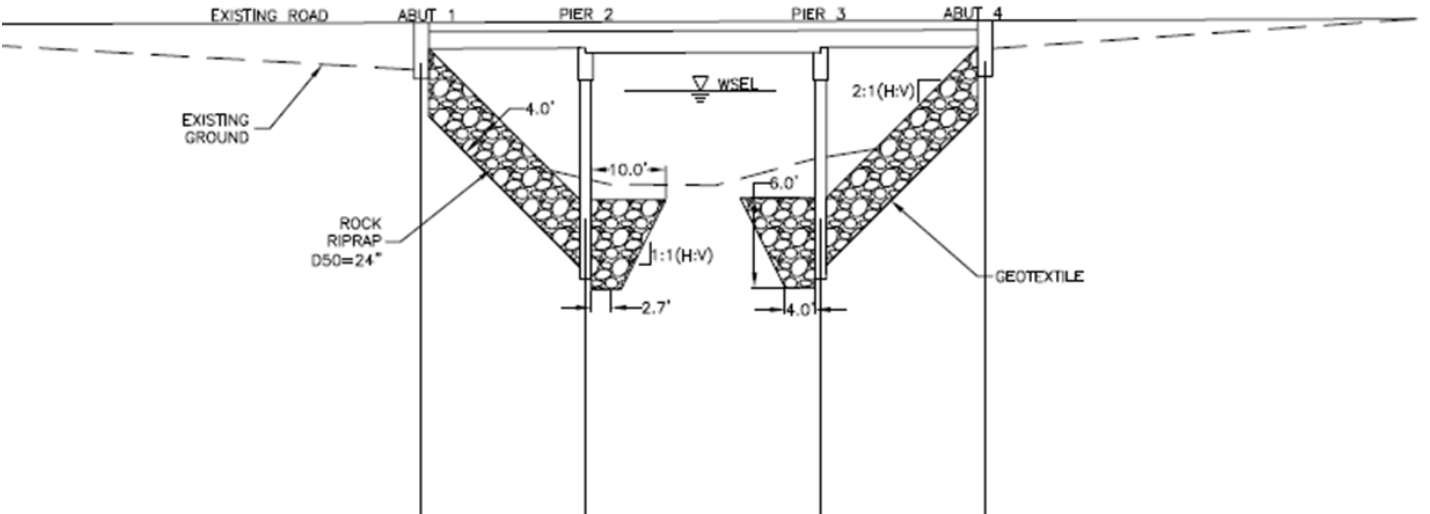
Cross-sectional view of Bridge D-20-T with recommended hydraulic scour countermeasures
